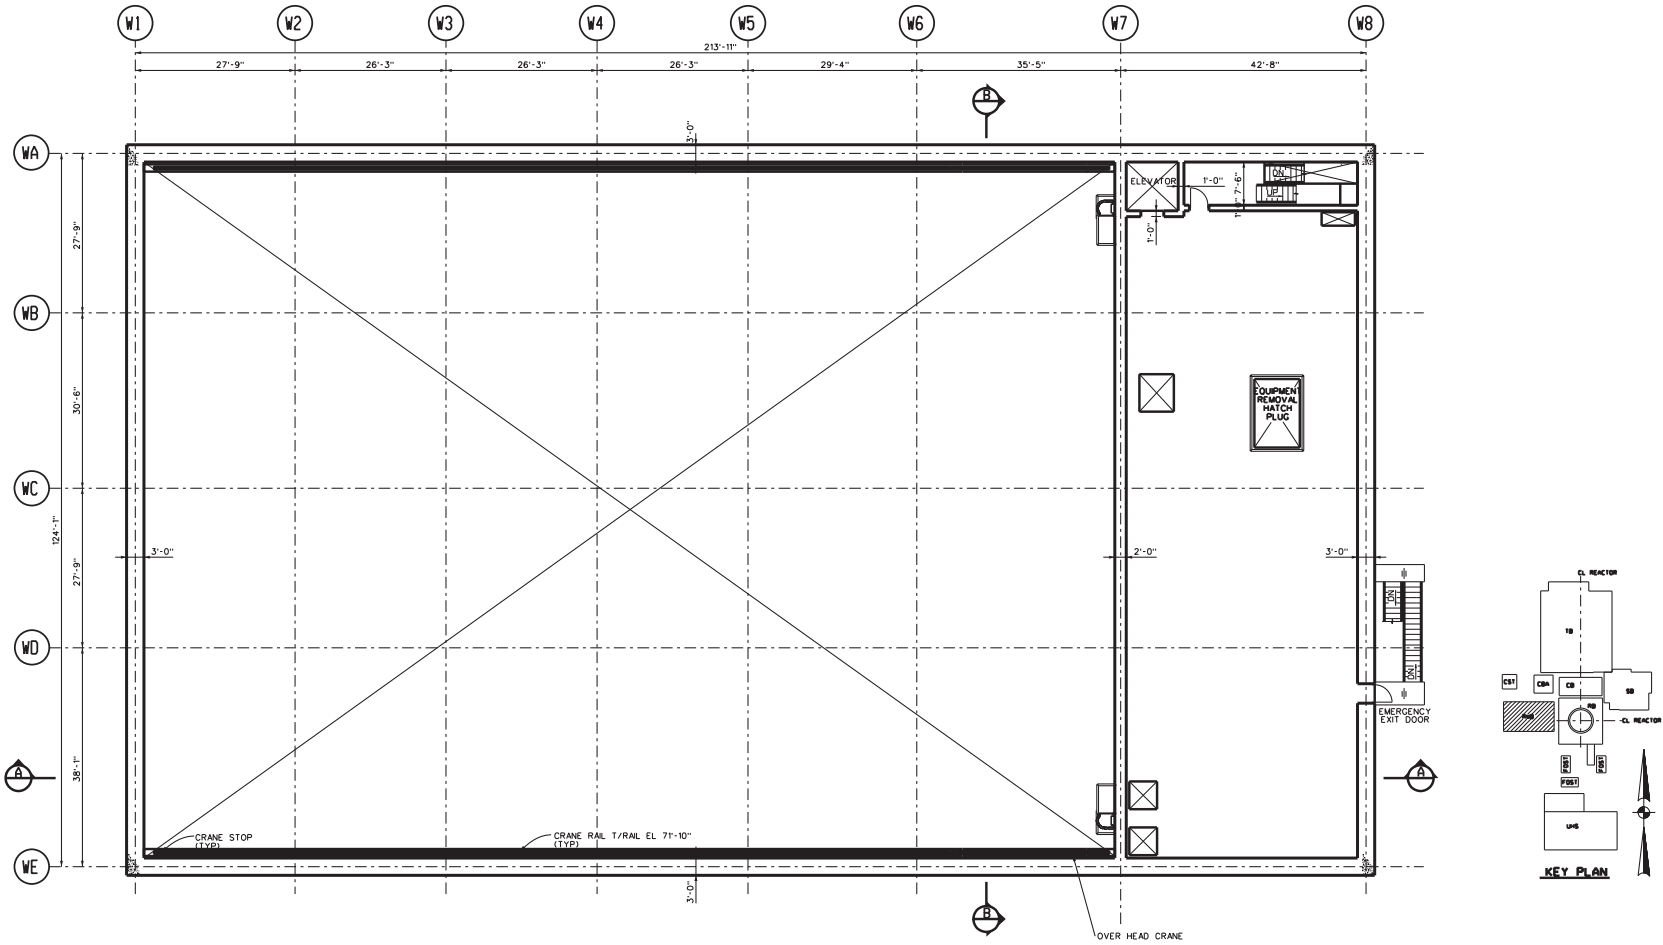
H.3-57 Radwaste Building Floor Plan at Elevation 57'-2"
